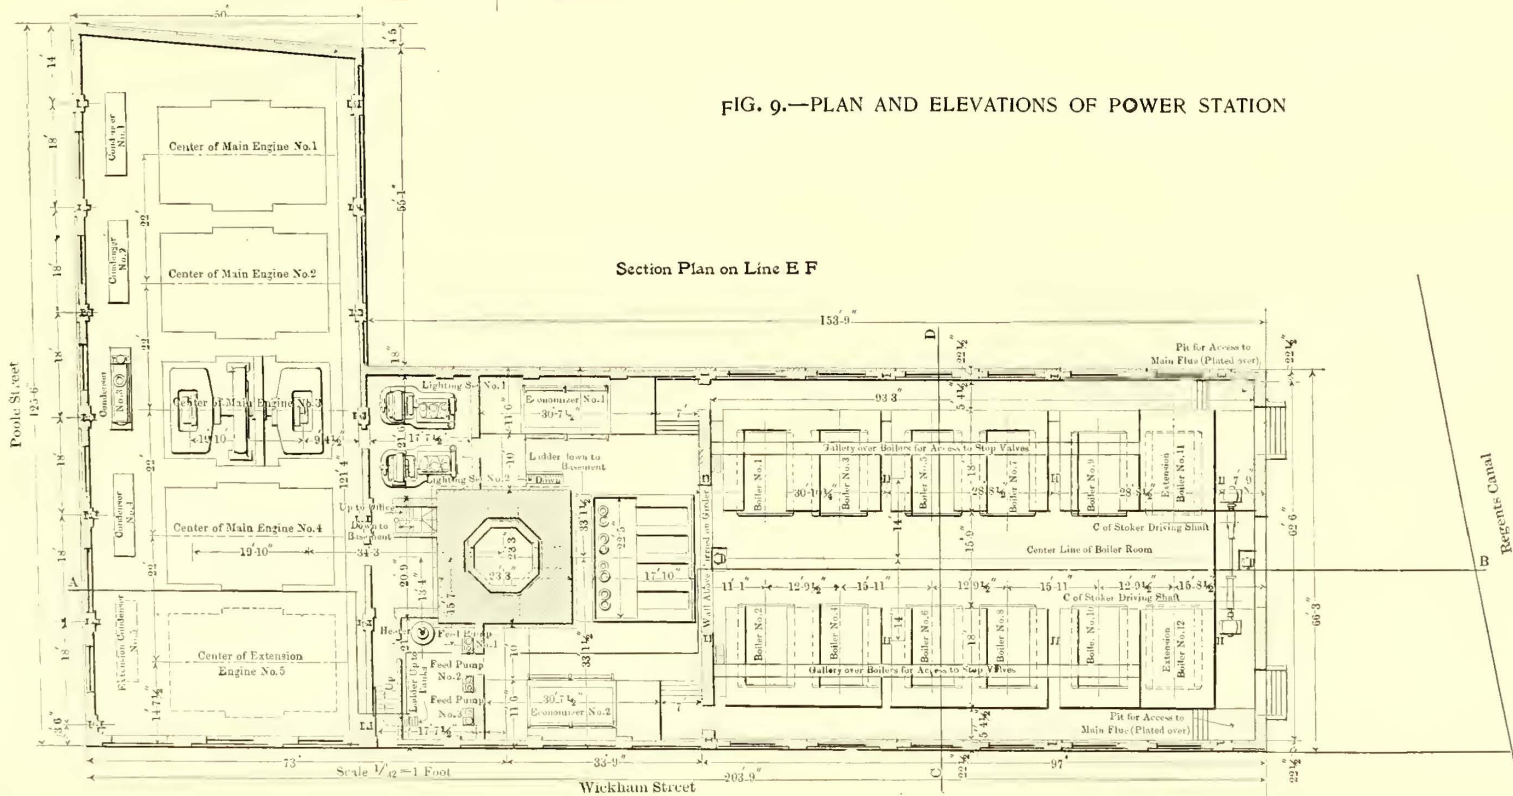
PLAN AND ELEVATIONS OF POWER STATION
